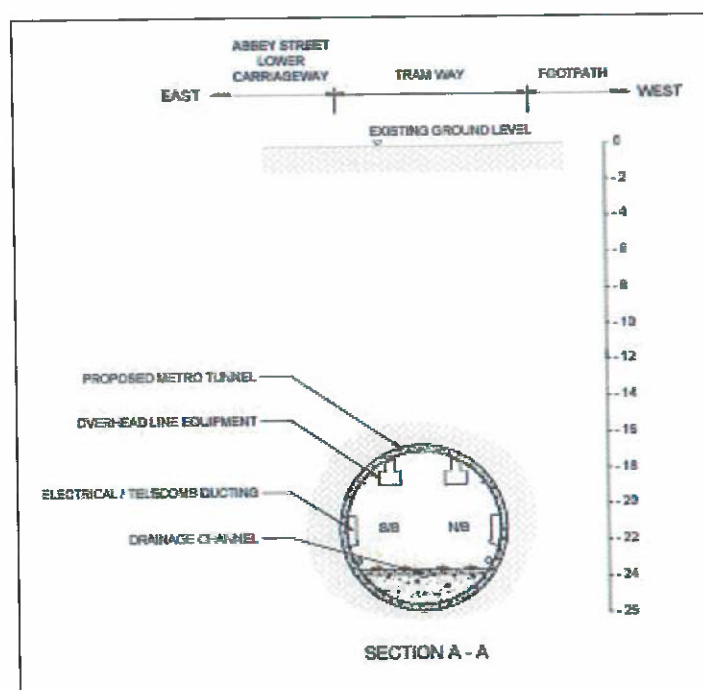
Tunnel Section – O'Connell Street to Burgh Quay (Lower Abbey Street)
